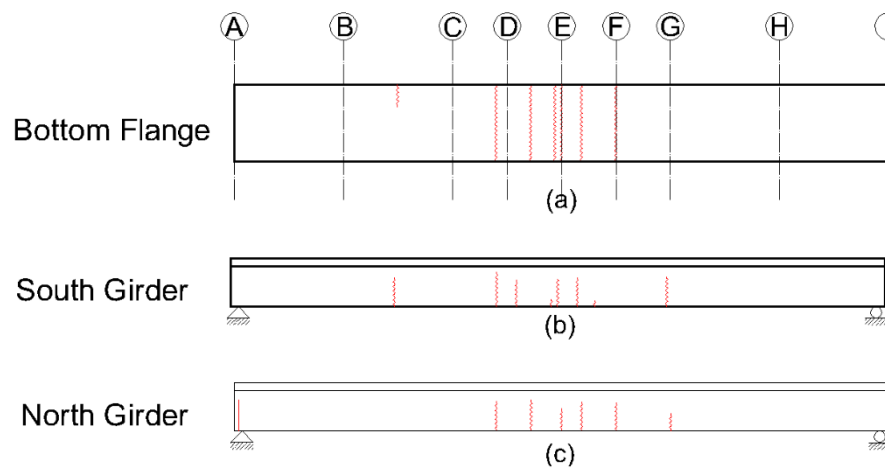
Crack distribution in test 03 at (a) bottom flange, (b) South girder, (c) North girder
